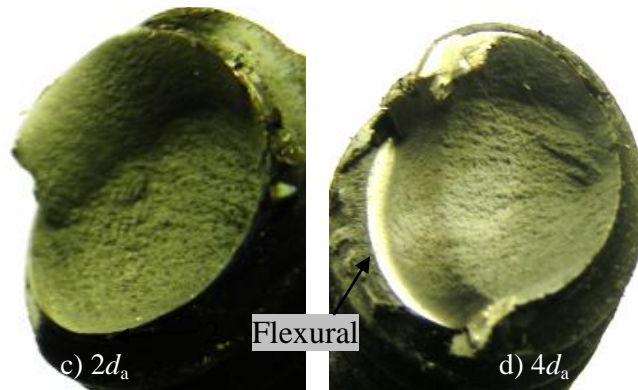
Typical fractured surfaces of threaded rods in shear
